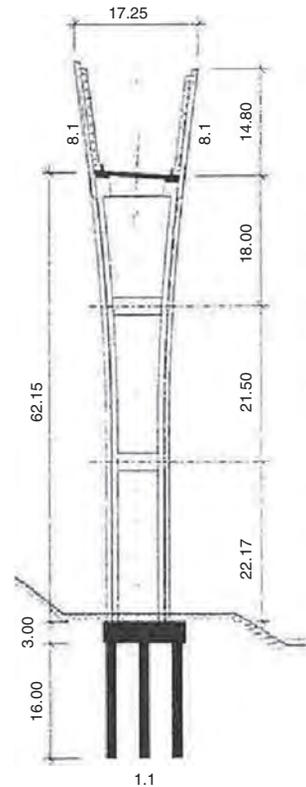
Sunniberg Bridge cross section<sup>7</sup>
